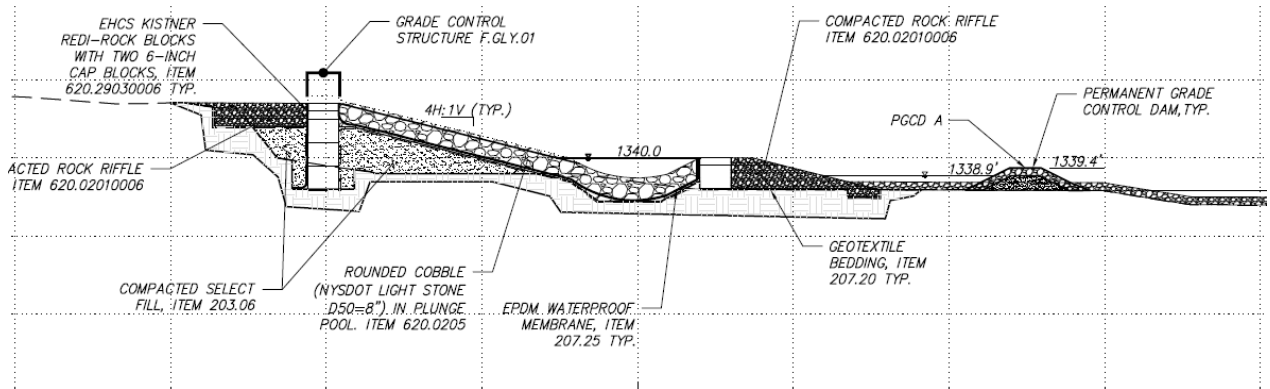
Typical erosion control structure design with anchored grade control wall and pool-riffle sequence.
